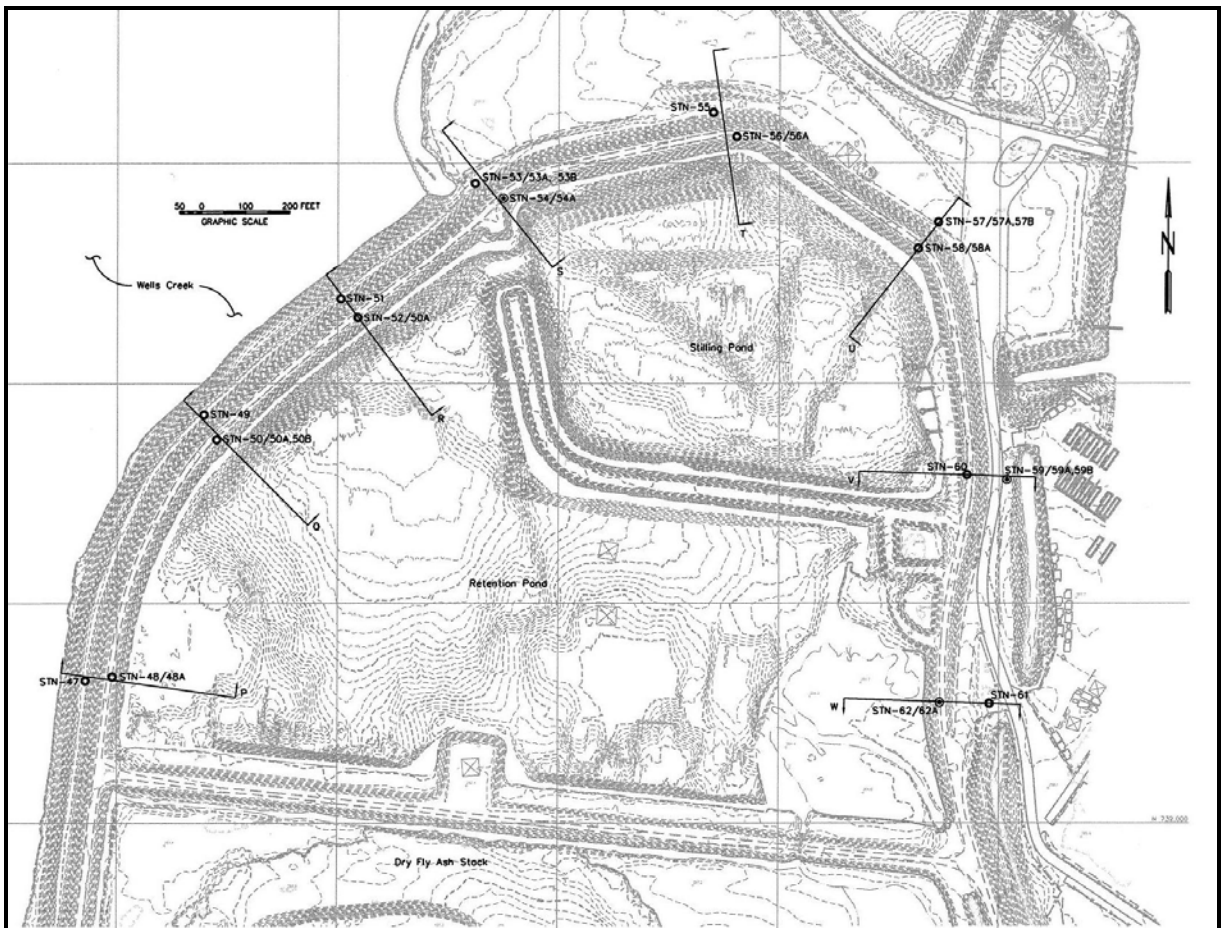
Plan View of the Retention and Stilling Ponds with the Locations of the Stability Cross-Sections Indicated.
